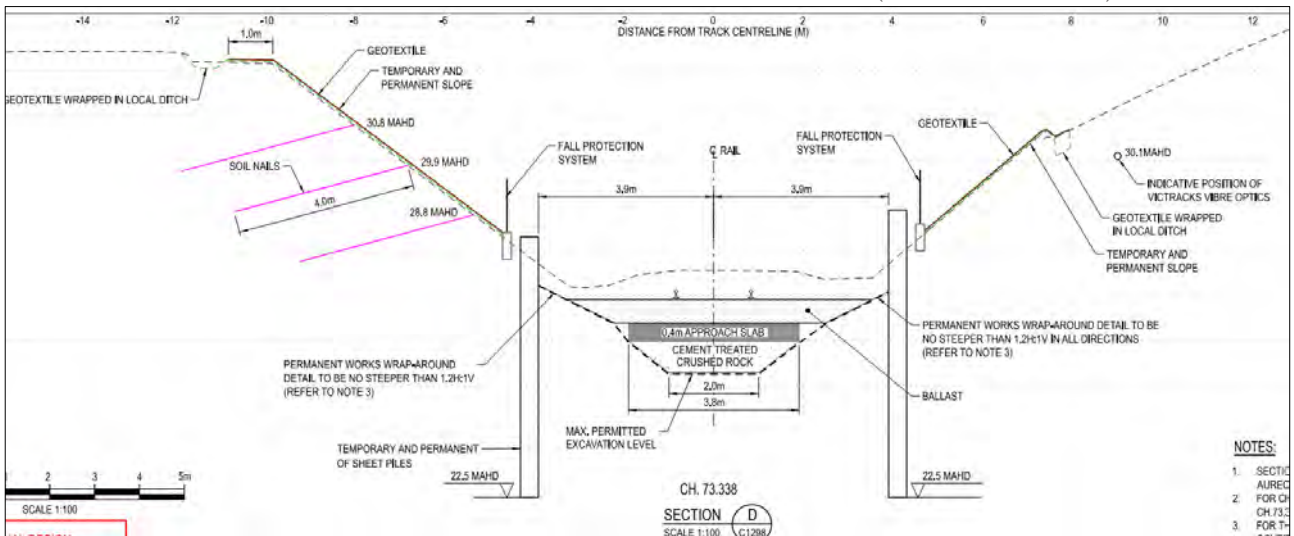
TYPICAL SECTION AT CH. 73.338 SHOWING RETAINING WORKS AT DOWN-END PORTAL (SOURCE: AURECON/VLINE)
